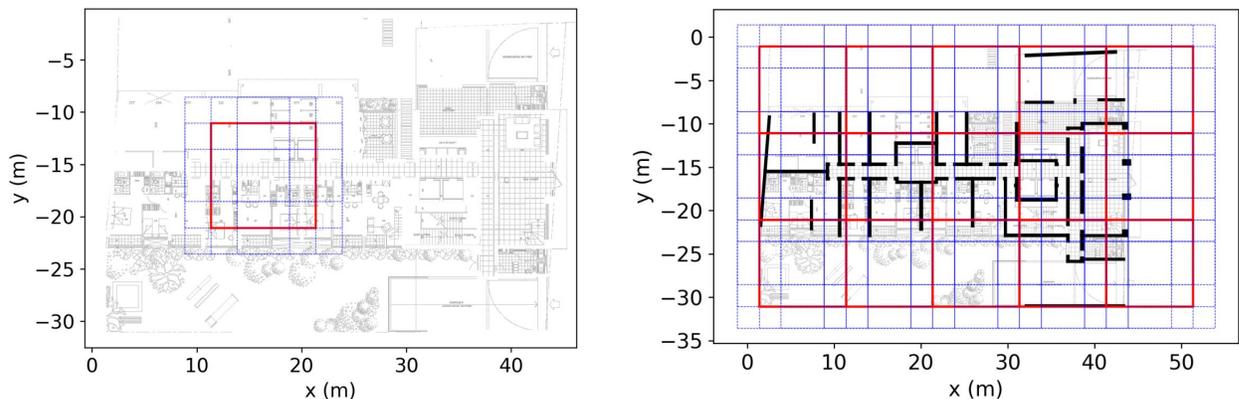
Schematic of the wall retrieval method from rasterized floor plans proposed in this thesis.
